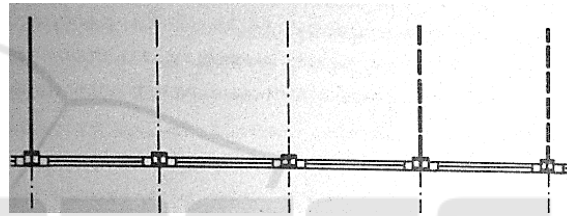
Examples of envelopes, placed in the structural plane – small scale.
